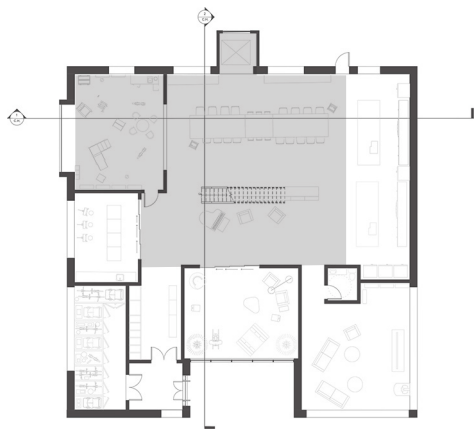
Author, Proposed Ground Floor Common Dining Render with Key Plan, 2019.
